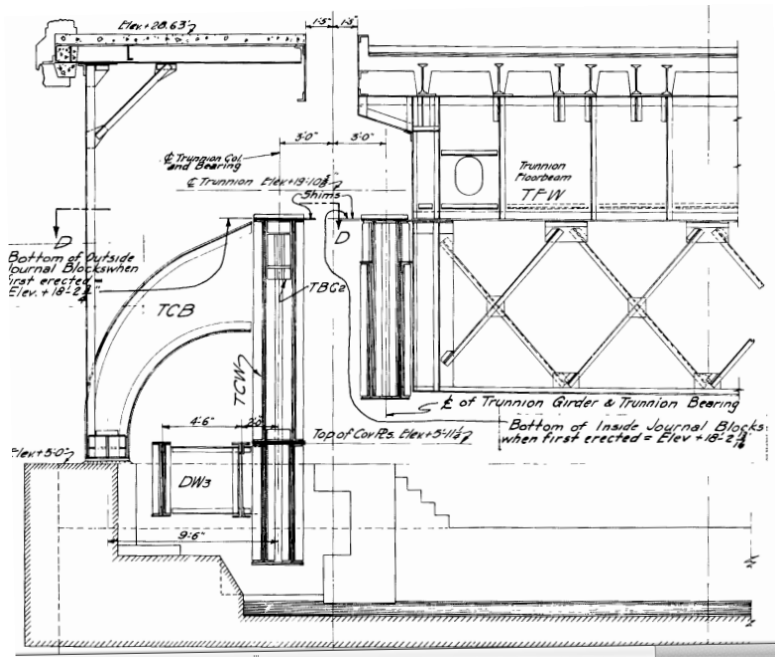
Section thru Pit shown Longitudinal Girder and clearances
